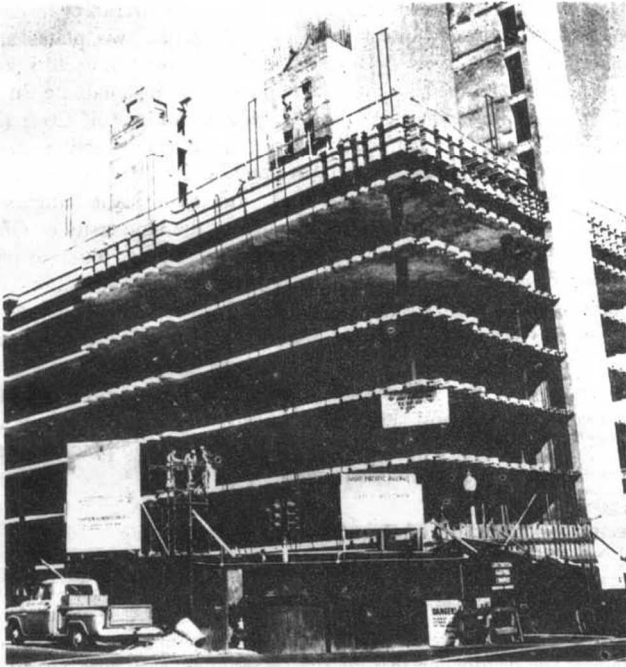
Thirteen-story apartment building with all slabs posttensioned on the ground being lifted into position; 8-in. lightweight concrete spans 28-ft; San Francisco (Owner George Belchër, Engineer August Waegeman, Consultant T. Y. Lin and Associates).
